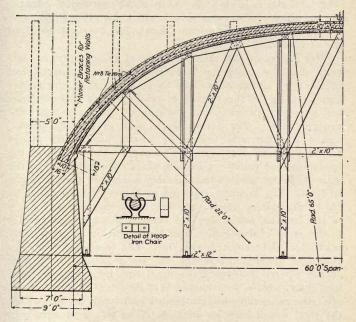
Centering and Reinforcement for Santa Monica Viaduct.
